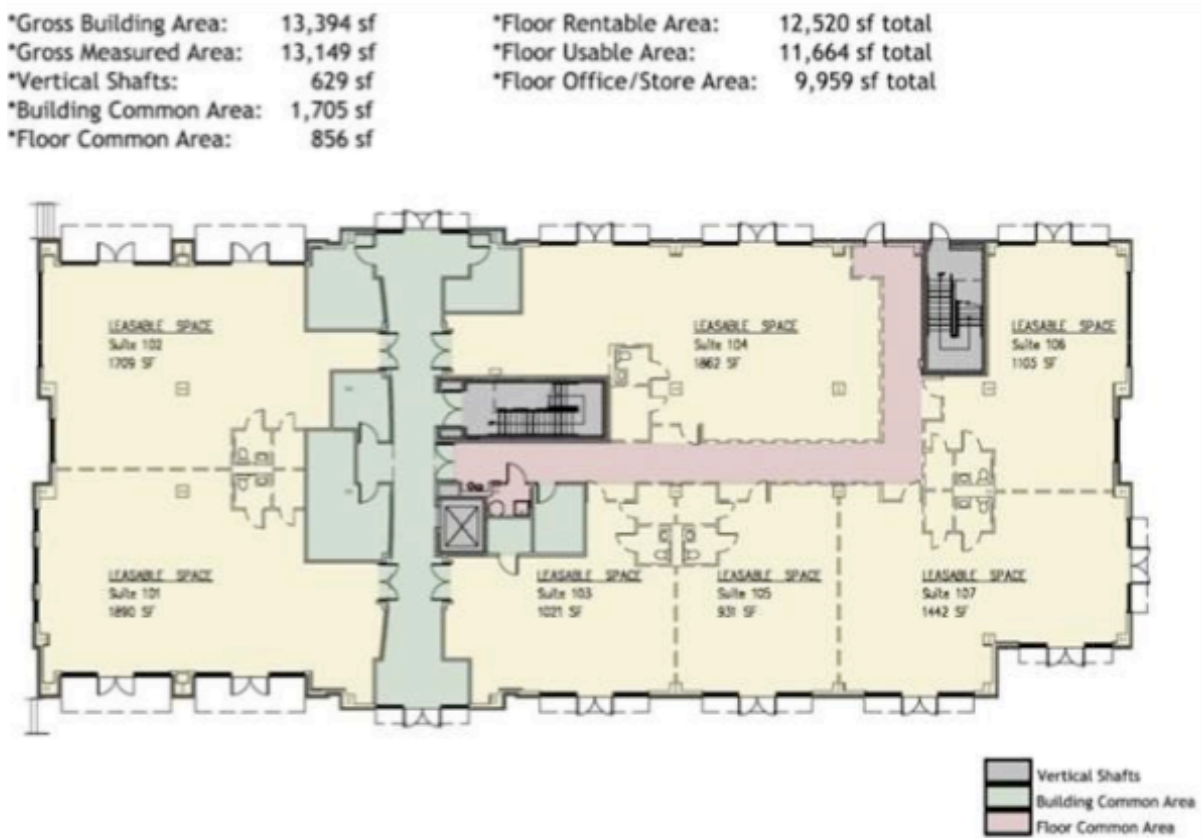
Proposed Medical/Business Office Building Floor plan. Plan represents half of the full building floor plan. The development analysis assumes that the Net Floor Area will be maximized for the site-specific building design. Actual floor plan will also detail the main access area and elevator corridor between the two halves.
